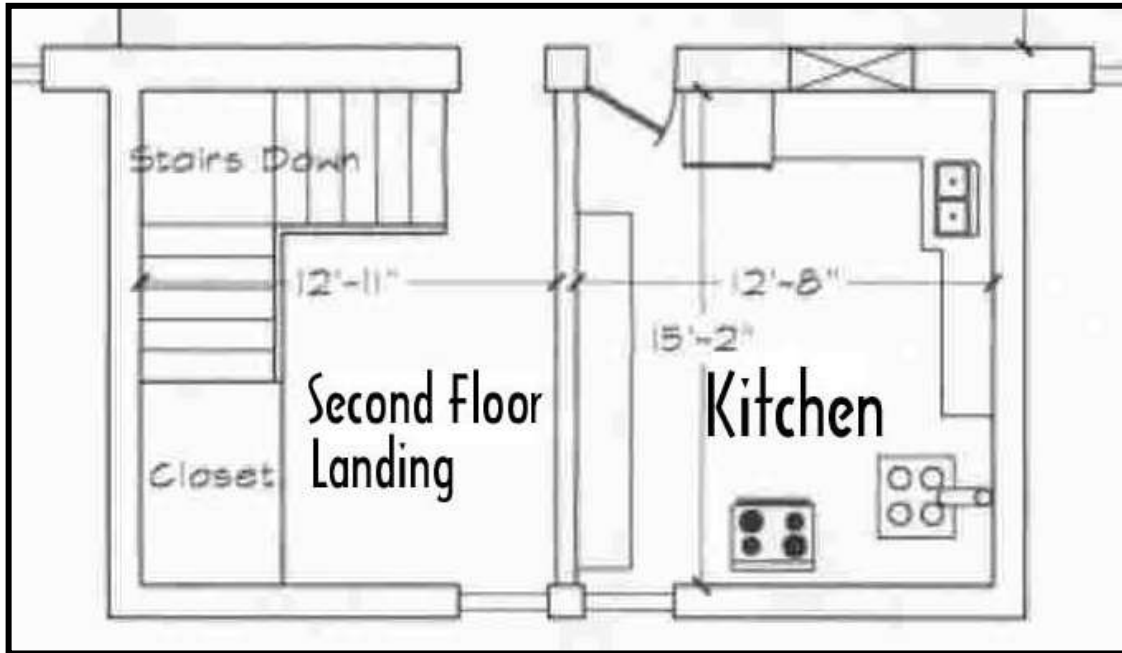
Landing-Kitchen Today. The north-south wall dividing the landing today was added later than the floor, possibly as late as the 1940s, because it is drywall. The top of this wall also spans the attic access that would have in turn allowed access to the Cupola and bell. There is a small hole in the entry ceiling that would have been where the bell rope emerged. The bead board wainscot on both sides of this wall is of a different style than that elsewhere in the entry and stair, but they are the same as that of the "closet" seen in the lower left of the landing.
